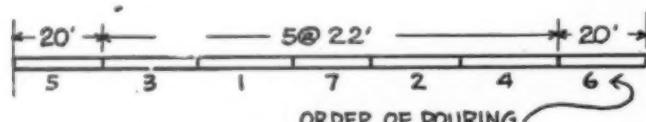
Showing the Order in Which Concrete Strips Are Poured for a 150-Ft. Runway. Note That Center Strip Is Poured Last
